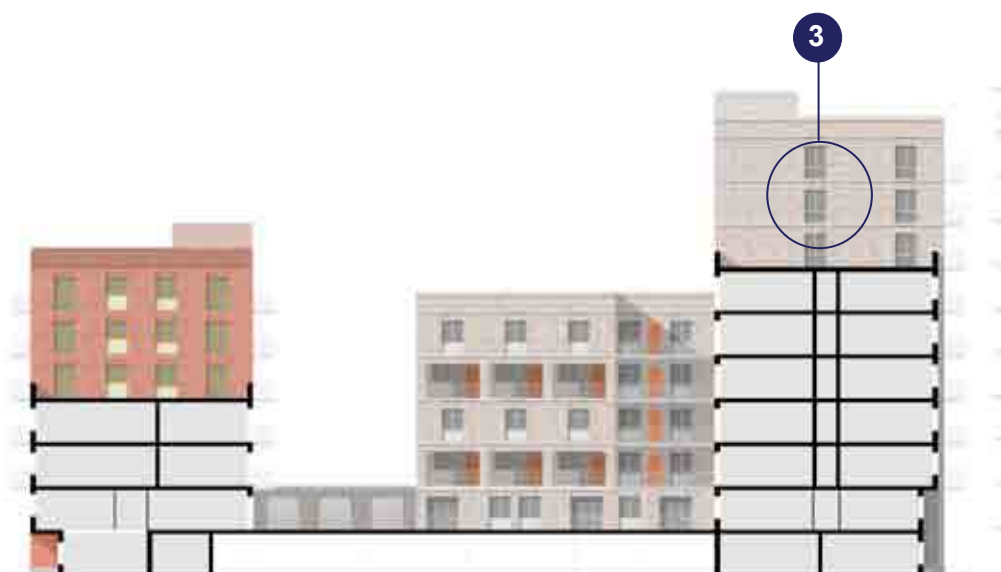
Block 4 East Elevation (Courtyard) Revised Planning Submission February 2015
